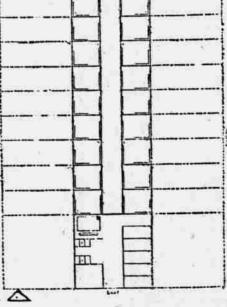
FIG. II.-GROUND PLAN OF HOG HOUSE. the roof on the north side and alley is made steeper so as to have more all space and good ventilation.
